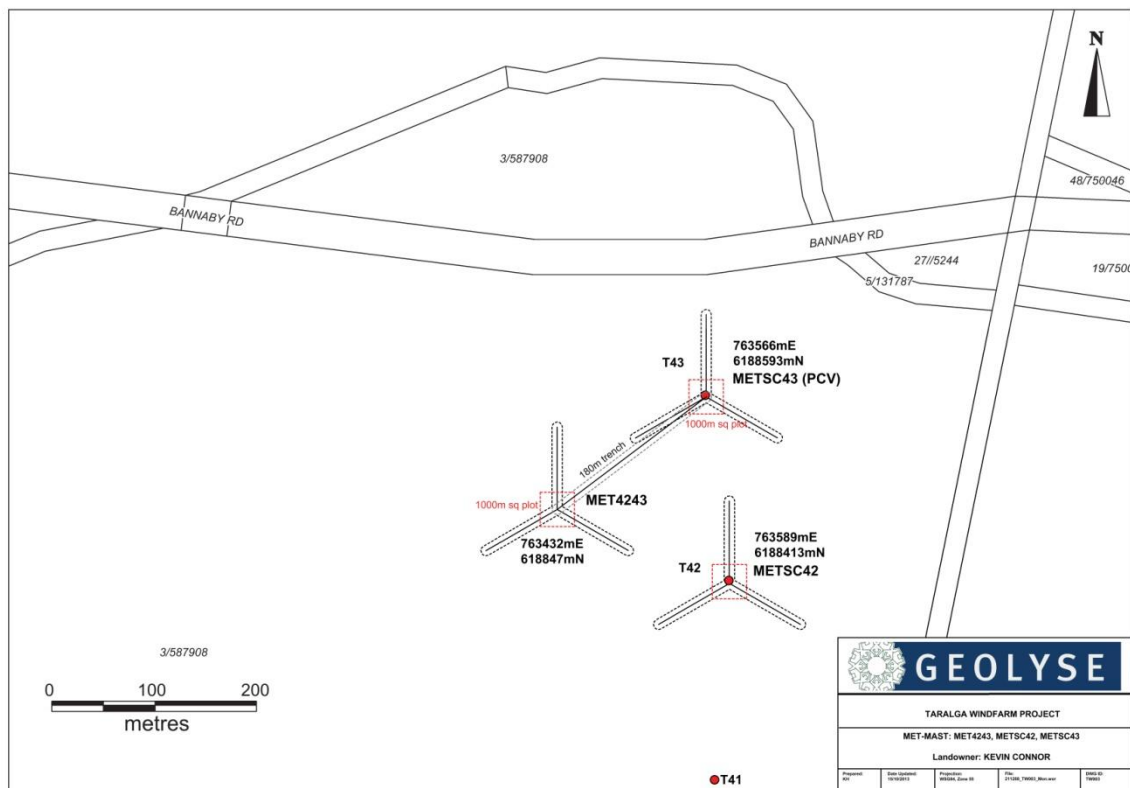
Plan of the proposed works at met-masts #MET4243, METSC43 (and proposed trench), and METSC42.
